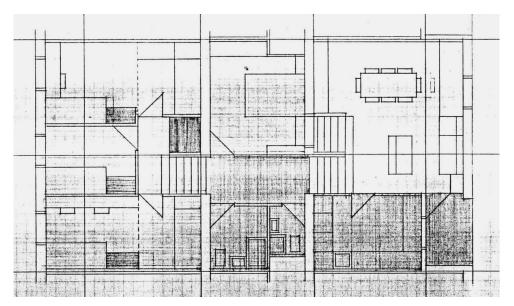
Juan XXIII apartment floor plan (Fernández Nieto, 2006)
